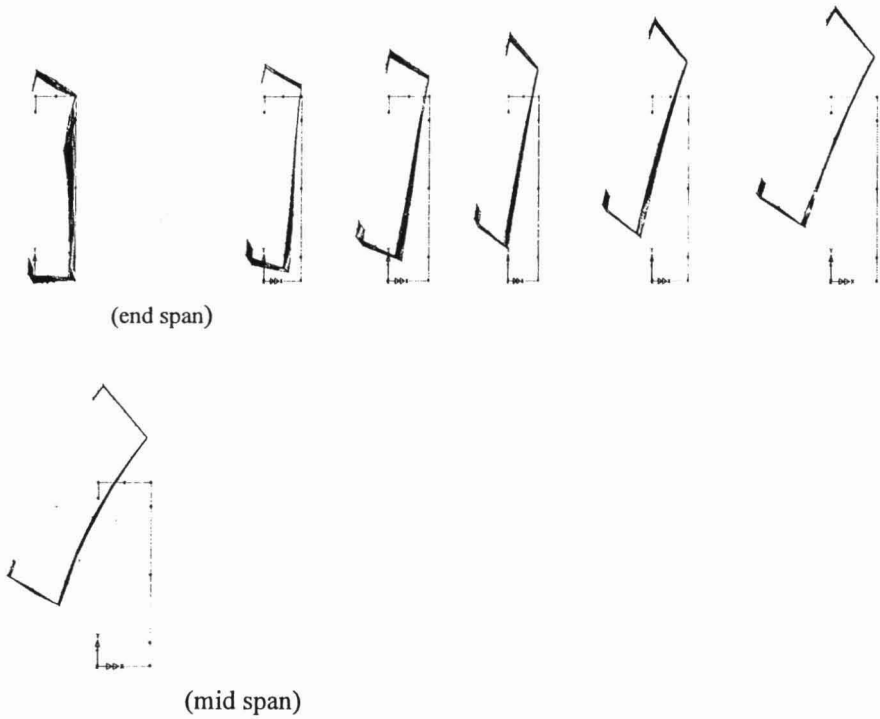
Cross section deformation through the span from end span to the mid span of purlin under upward loading
